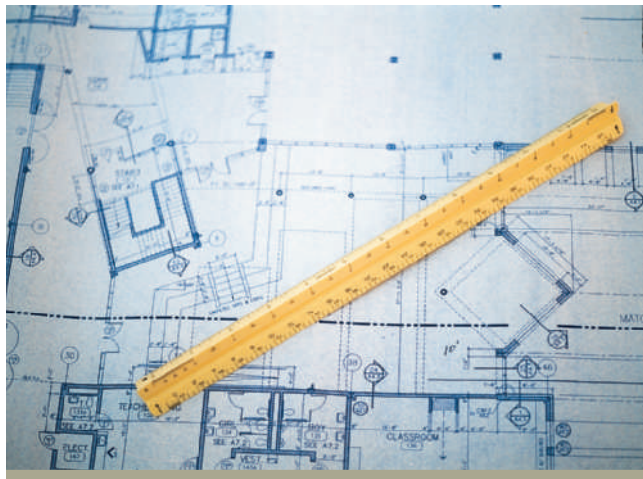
A scale ruler is often called a scale and is used to dimension a blueprint.
